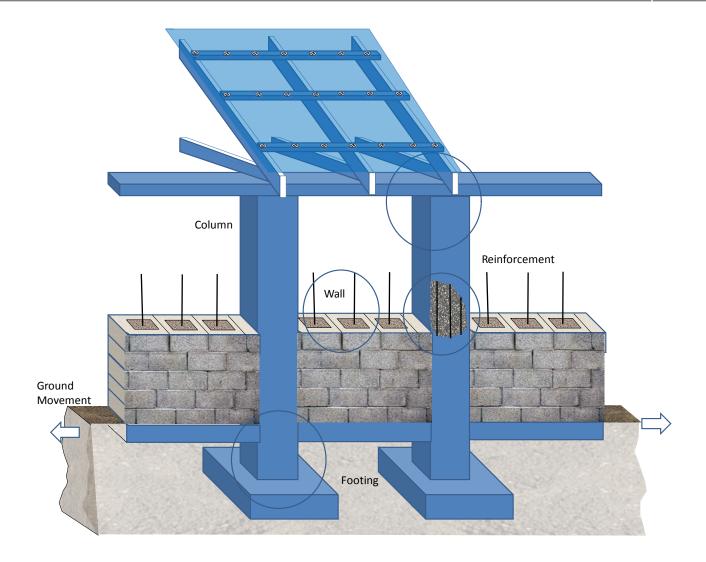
Critical connection areas in designing building structures to resist seismic loads.
